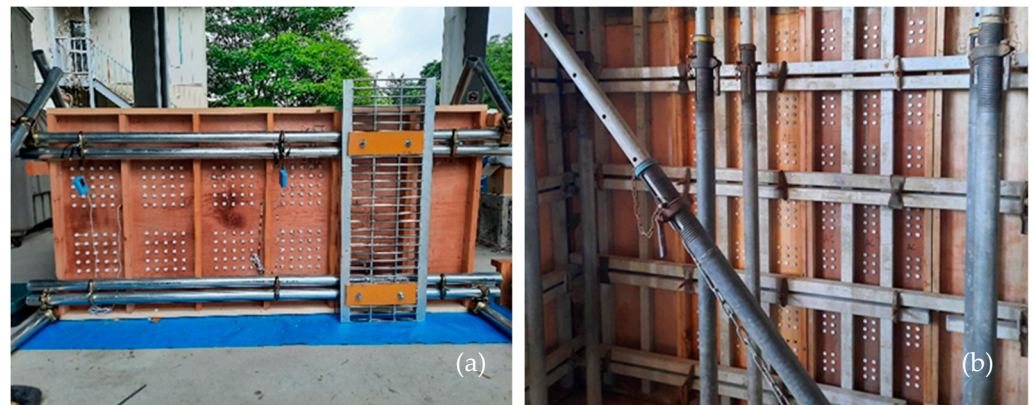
Test holes at mold (a) mock-up mold (b) construction site.
